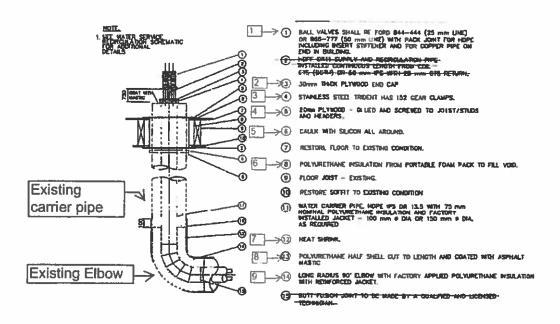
Detail 1 - from drawing C-330- Water service connection kit at main - Plan view
